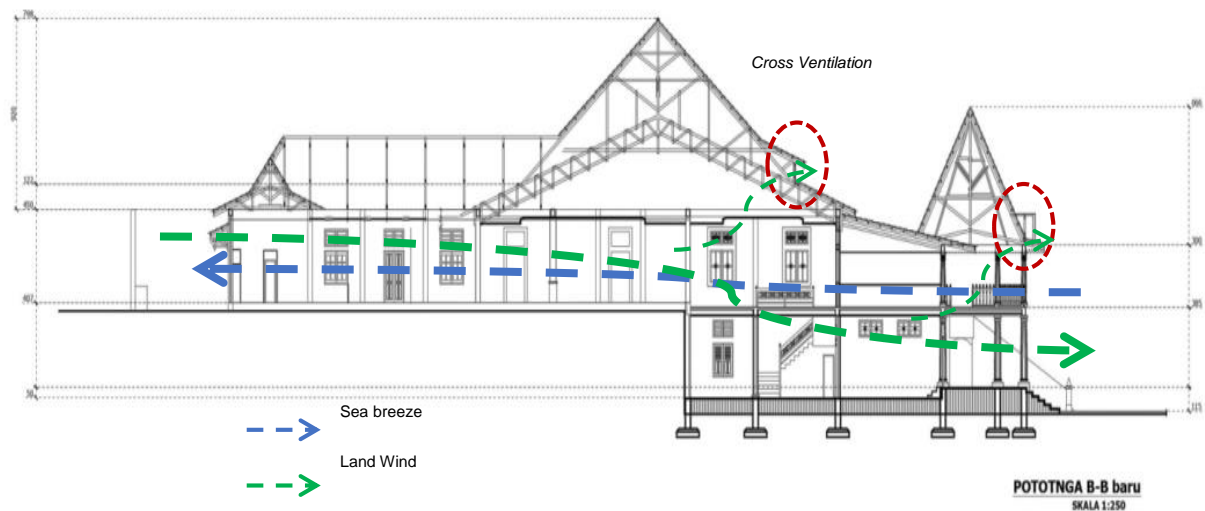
Kadato Kie Building Aperture that adapts to Tropical Conditions
